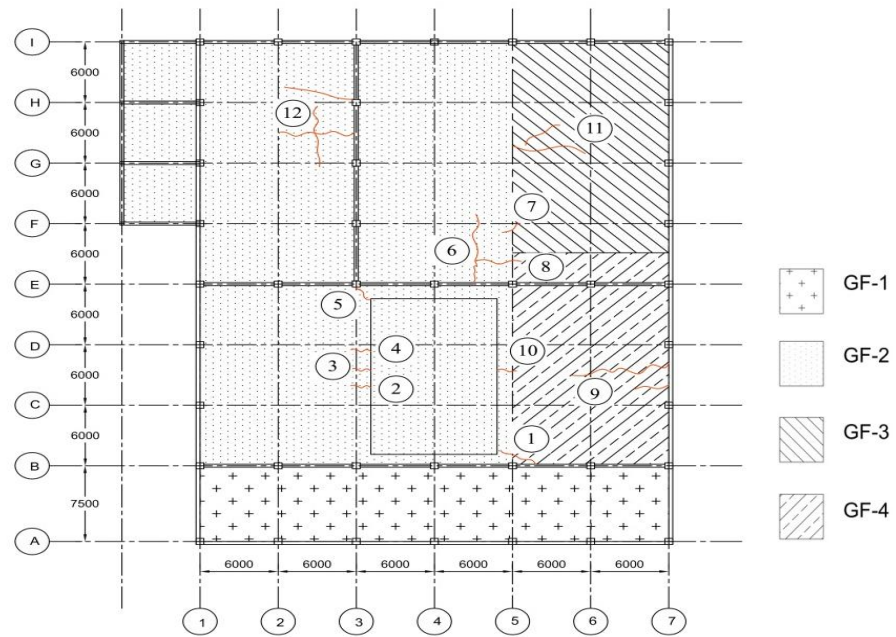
Location of cracks in floor plan in Project-B
